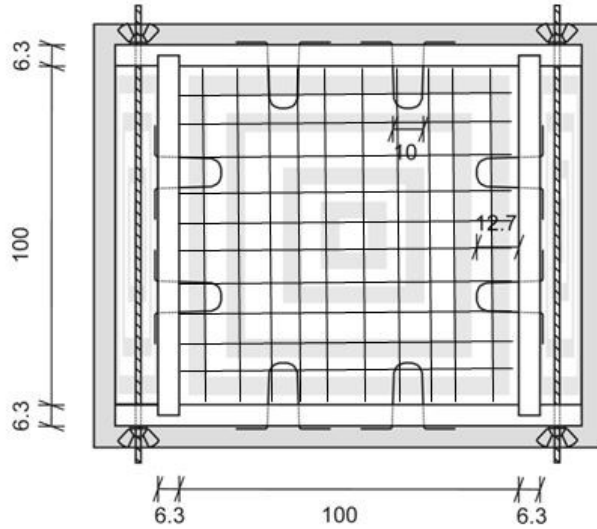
Plan View of the Mold with the Textile Reinforcement (numbers in mm) [33]
